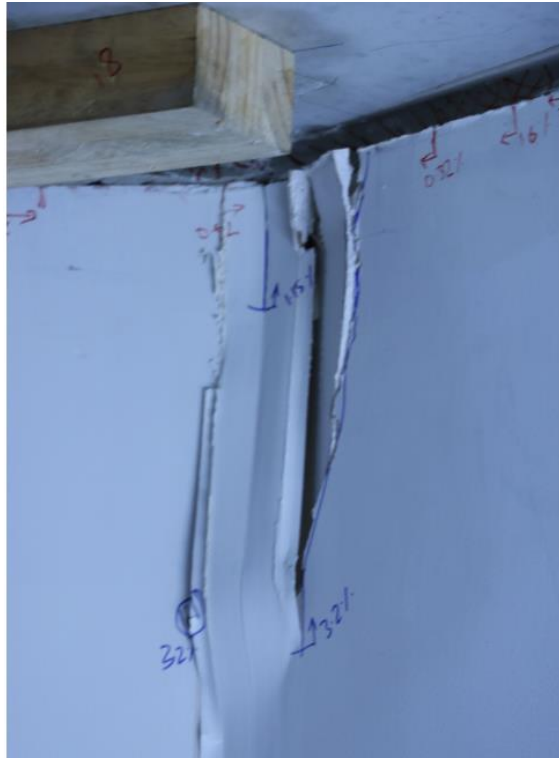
Specimen A2 - Step 15 – DS2: Wallboard damage – location 19
